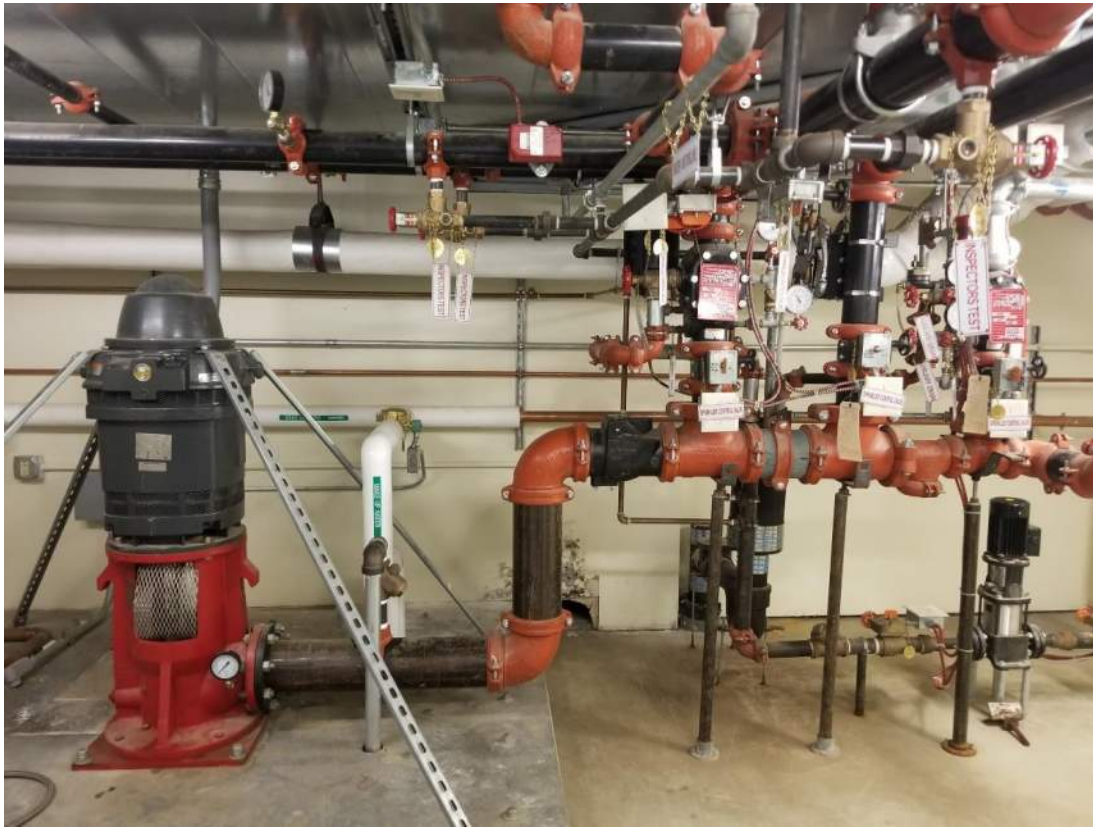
Fire pump room and suppression system. Fireproof insulation needs to be installed in rooms' penetrations. See item L-S-5 of Appendix A.
